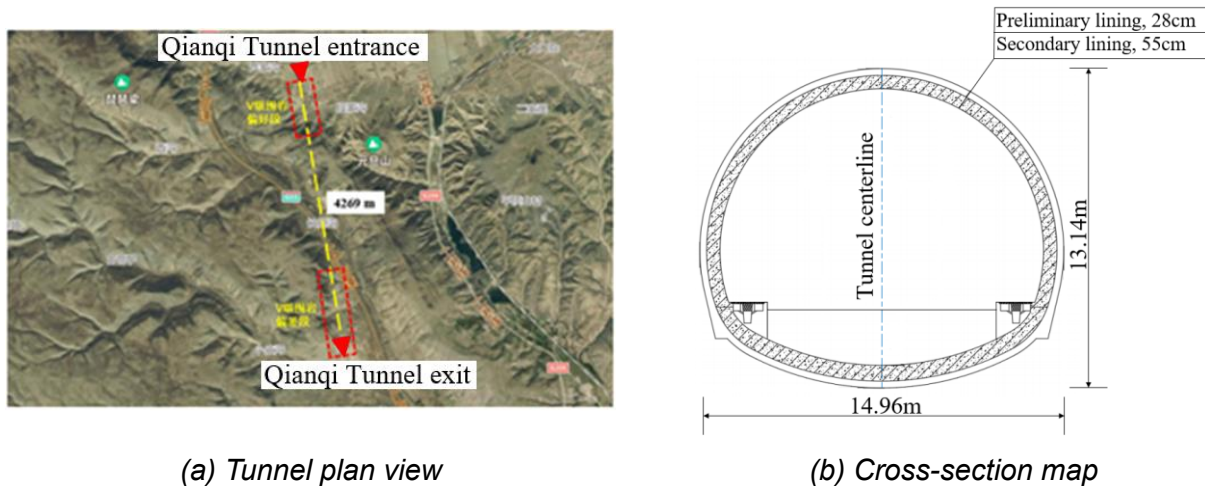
Plan view and cross-section map of the Qianqi tunnel
